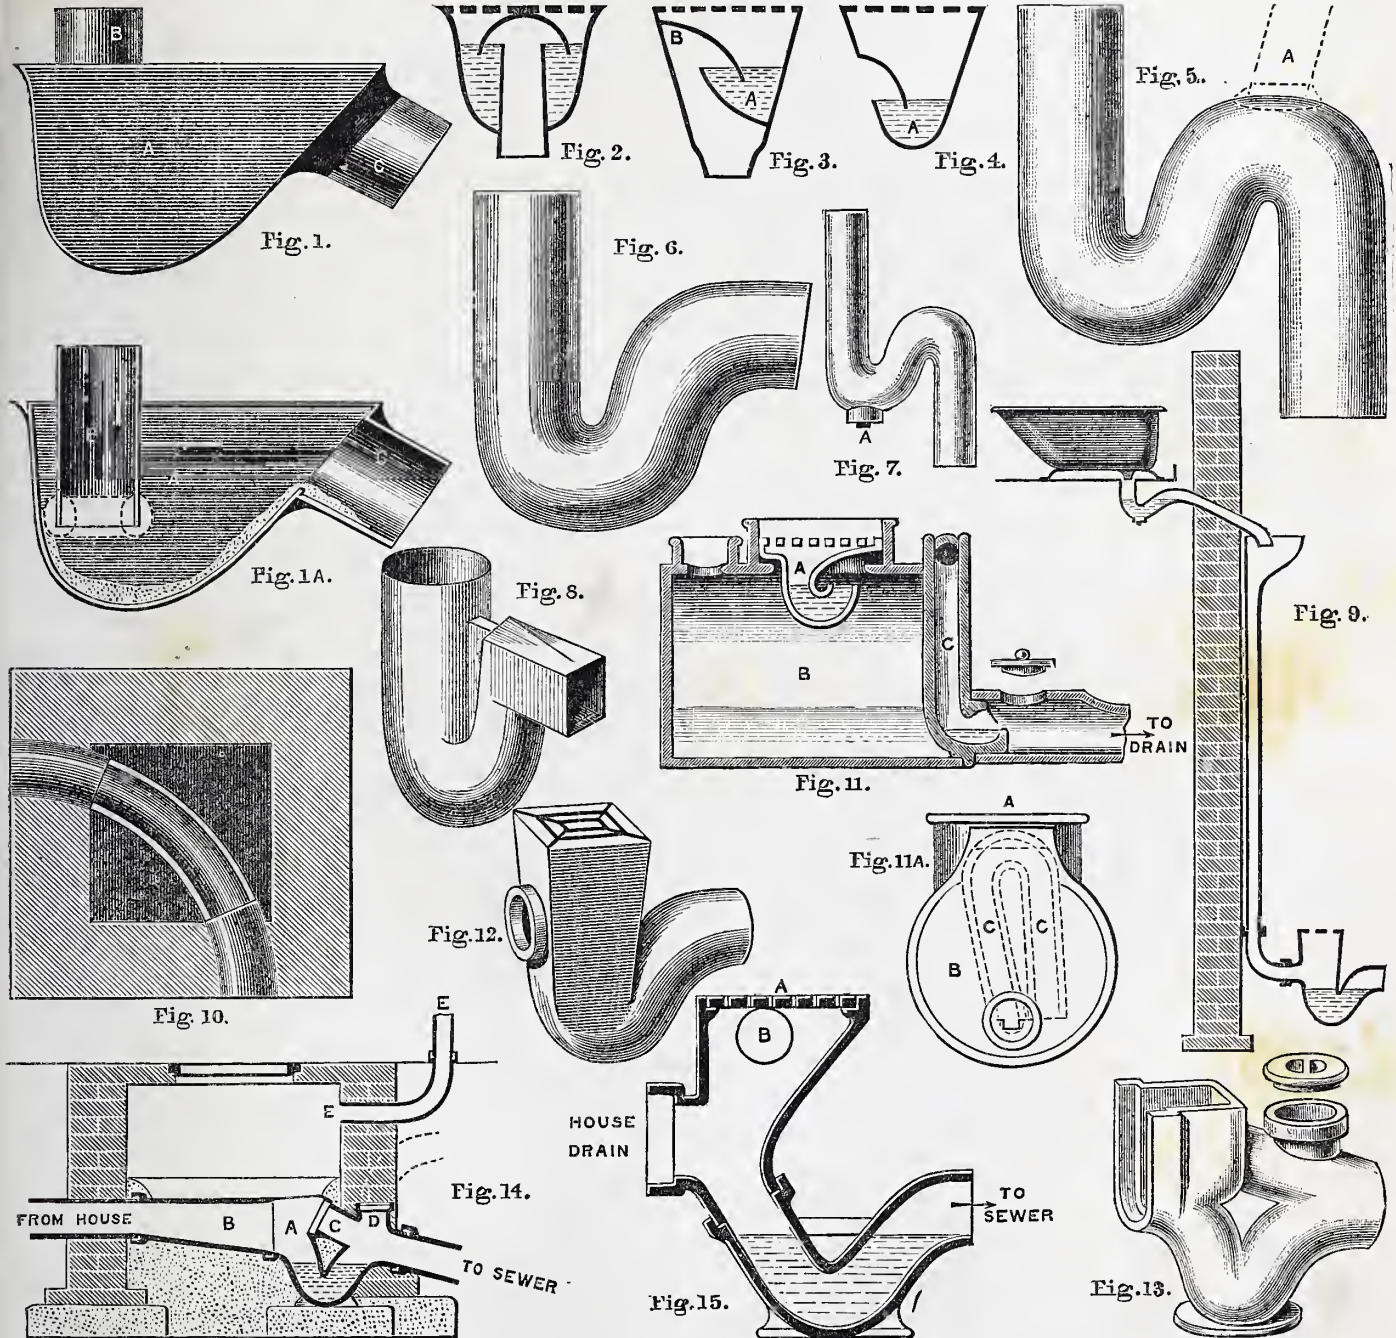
Lead D Trap. Fig. 1 A.—Section of ditto. Fig. 2.—Bell Trap: section. Fig. 3.—Iron Box Trap: section. Fig. 4.—Iron Box Trap, sometimes called D Trap: section. Fig. 5.—Lead S Trap, showing Place for connecting Air-Pipe. Fig. 6.—Lead P Trap. Fig. 7.—Small Lead S Trap, with Cleansing Screw A. Fig. 8.—Hellyer's Anti-D Trap with Square Outgo. Fig. 9.—Diagram showing Manner of conducting Wash from Bath into Drain through Open Gully-Traps. Fig. 10.—Open Channel Bend fixed in Brick Manhole for Inspection. Fig. 11.—Field's Flushing Tank for Drains. Fig. 11 A.—Side Section of ditto. Fig. 12.—Gully-Trap, with Inlet at Back. Fig. 13.—Hellyer's "Drain Sentinel." Fig. 14.—Disconnecting Air Chamber with Hellyer's "Drain Sentinel" Trap and Channel leading to it—A, Trap; B, Channel; C, Inspection Arm; D, Arm for Air Inlet; E, Air Pipe to Manhole. Fig. 15.—Section of Hellyer's Ventilating Drain Syphon—A, Grating and Inlet for Air; B, Inlet for Air when A is covered.
